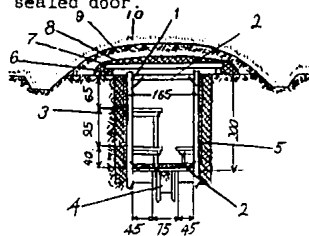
Dugout. 1 - posts; 2 - beams; 3 - packed clay walls; 4 - drainage ditch; 5 - board planking; 6 - foundation beams; 7 - covering of boards; 8 - clay; 9 - earth; 10 - turf.
